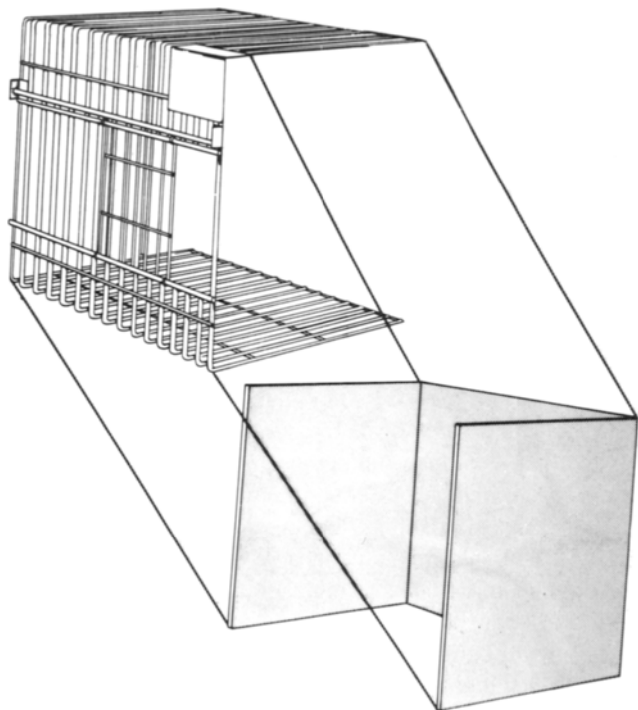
Common cage construction technique with two U-shaped units welded together to form a box-type cage.
